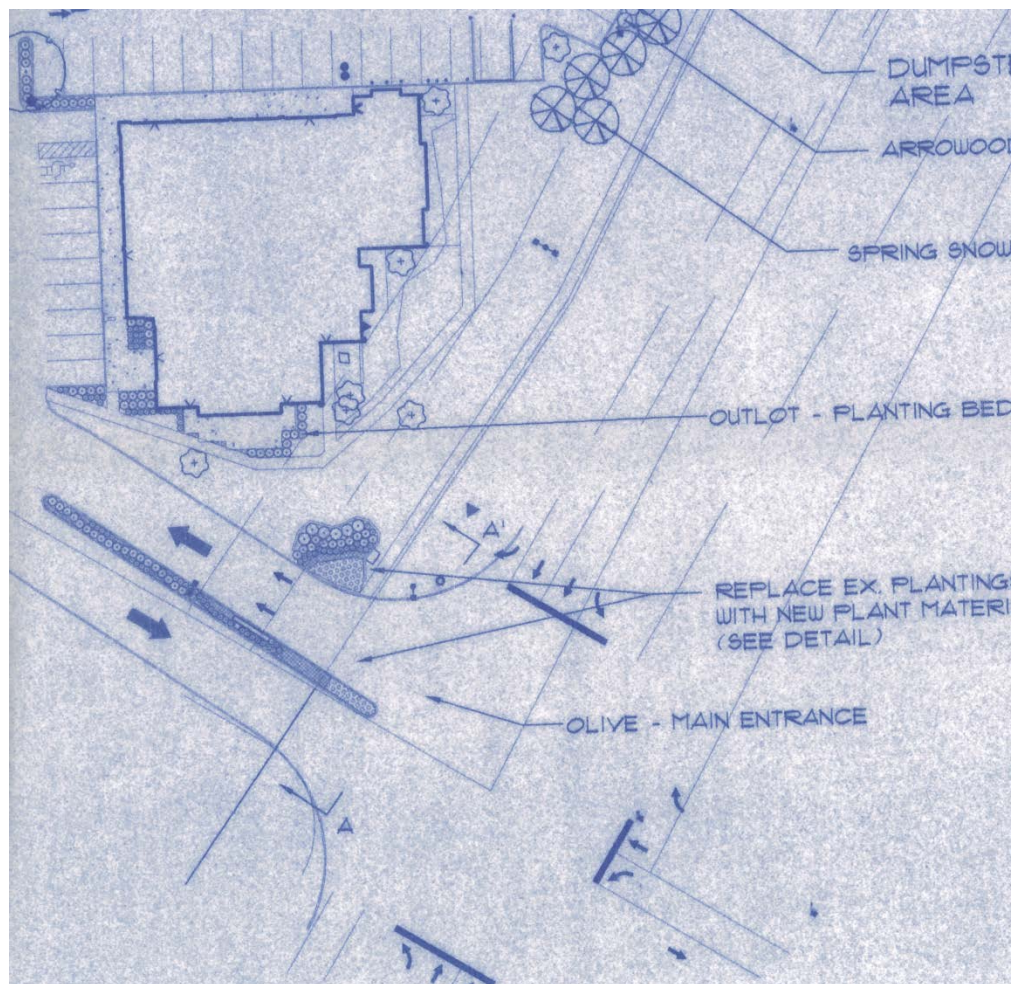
Detail of Landscape Plan, dated June 7, 1999
